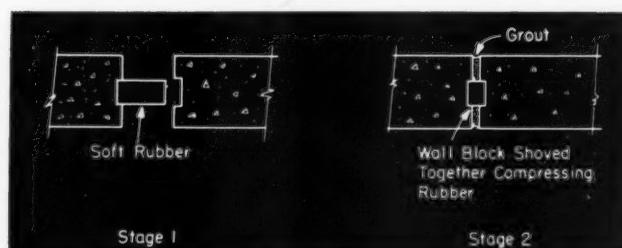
SUGGESTED METHOD FOR WATERPROOFING A VERTICAL JOINT IN A PRECAST MASONRY WALL.
